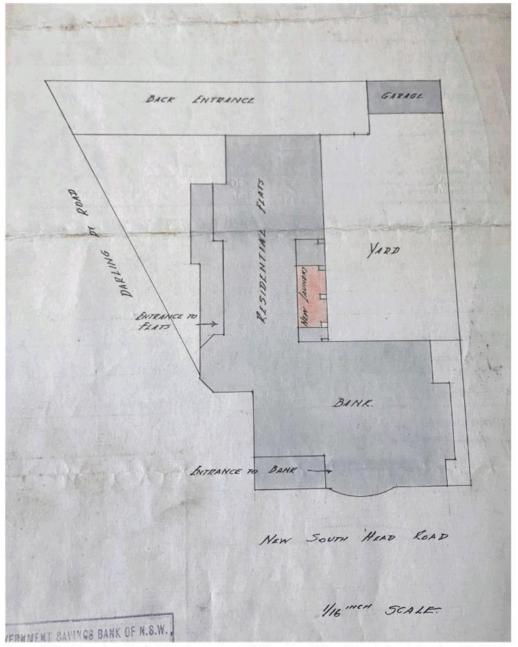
Plan of earlier building located at 136 New South Head Road, dated October 28, 1928, property of the Government Savings Bank of NSW.
